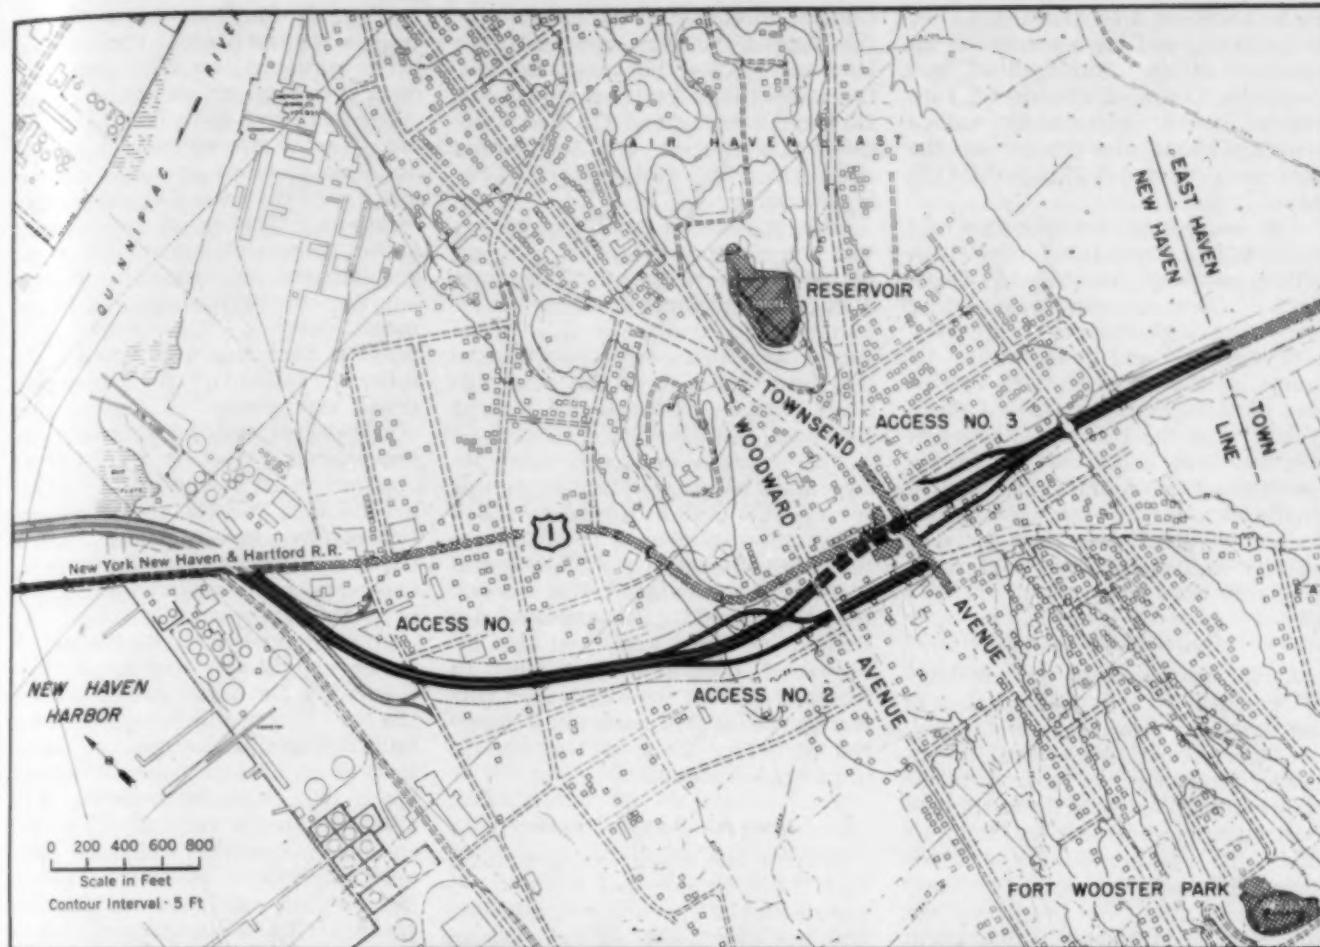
REPRODUCED FROM ONE-MILE-WIDE STRIP MAP—made in 1946 from aerial photographs—plan shows superimposed heavy black lines which indicate first stage of proposed reconstruction of Route U.S. 1 in New Haven, Conn. Section to west, shown shaded, is later stage of project. Line location and ramp connections are plotted wholly from topographic and cultural information on original aerial survey map.
